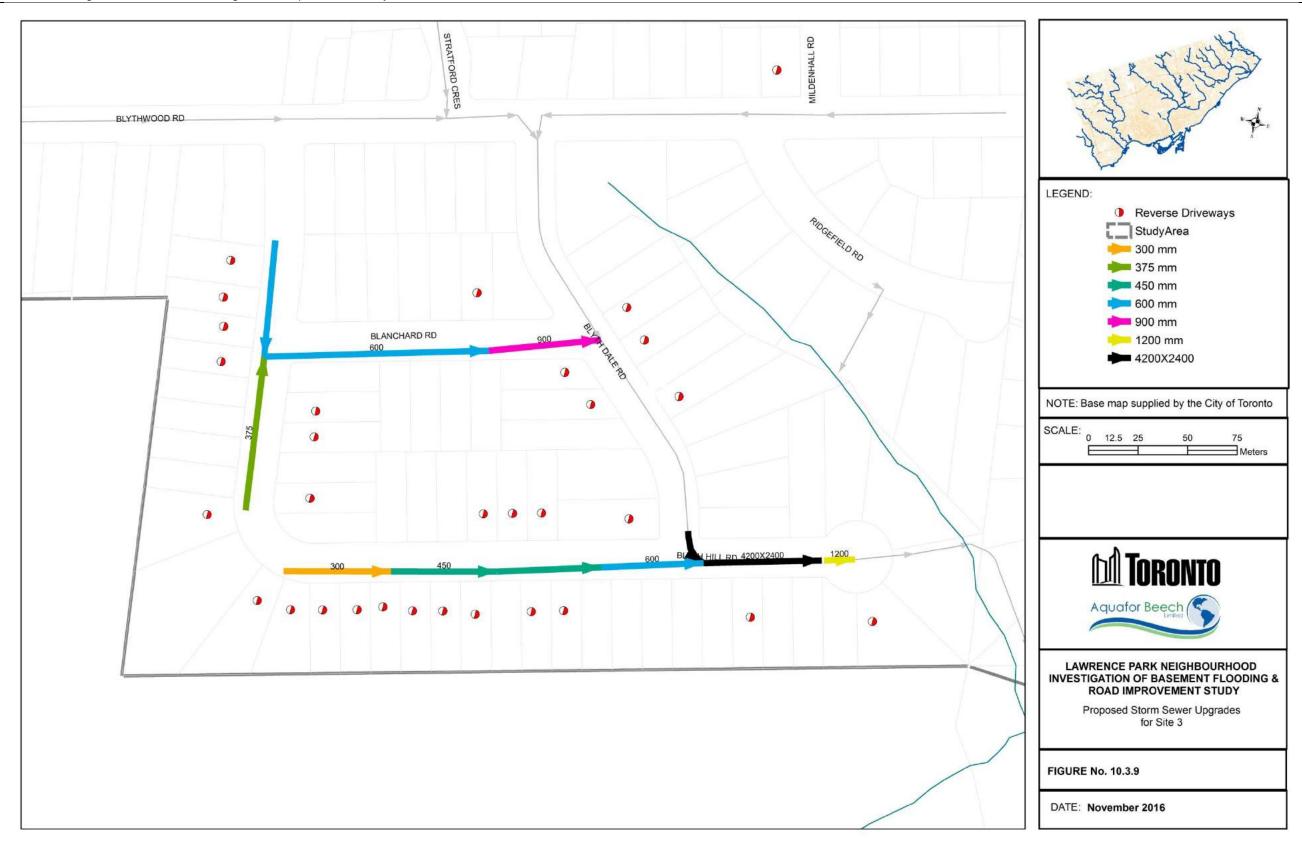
Proposed Storm Sewer Upgrade for Site 3
